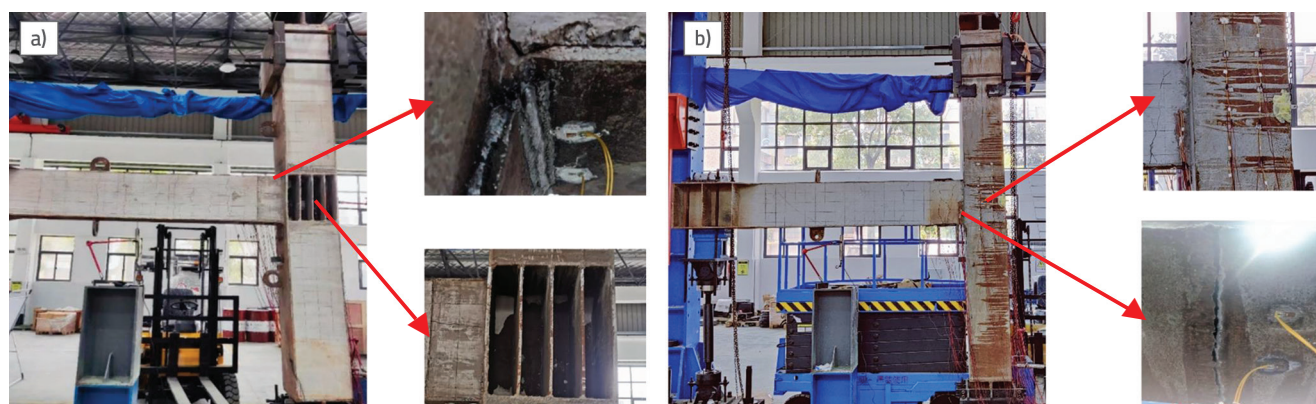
Failure modes of PEC joints: a) Failure mode of specimen J-1; b) Failure mode of specimen J-2
